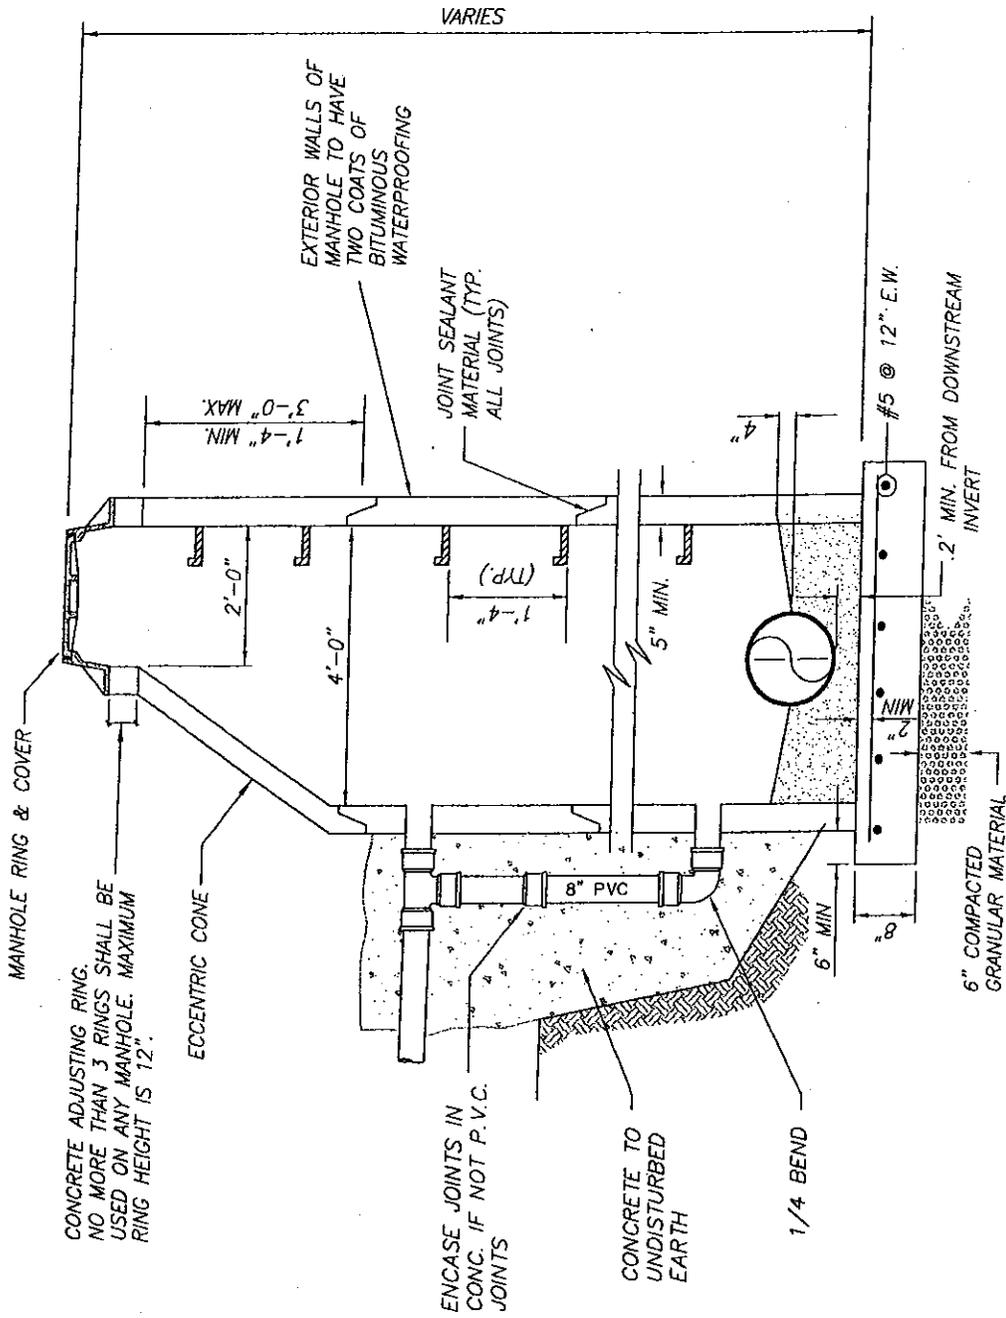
INSIDE DROP MANHOLE (GRAVITY)
